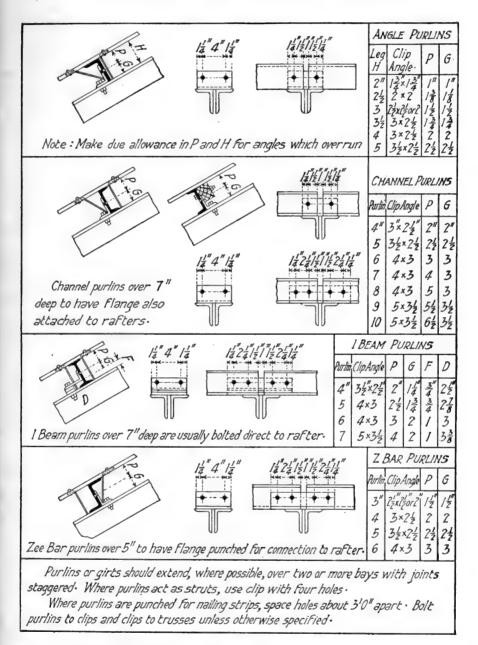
DETAILS OF PURLINS FOR CORRUGATED STEEL ROOF. AMERICAN BRIDGE COMPANY.
